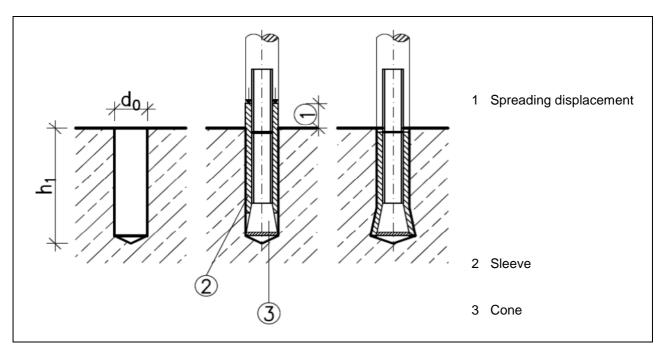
Fastener installation by hammering the sleeve over the cone; e.g. by using a drilling machine
